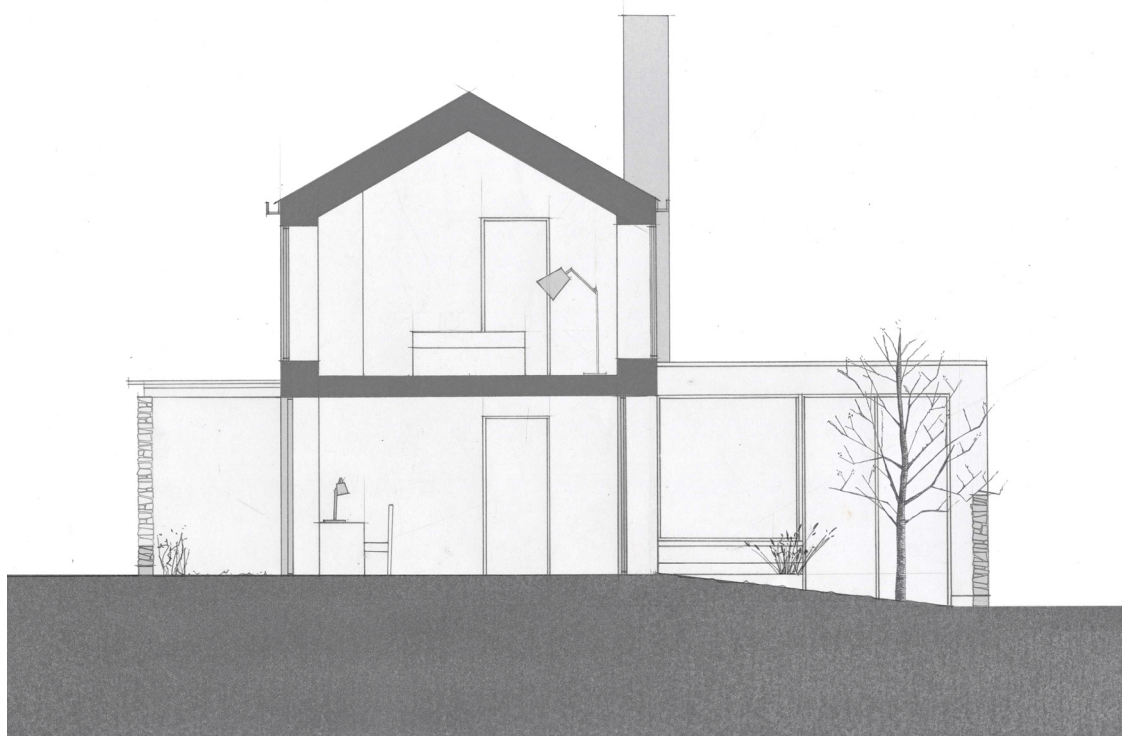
Section through office and main bedroom of 3 bed house type with private courtyard at 1:100
